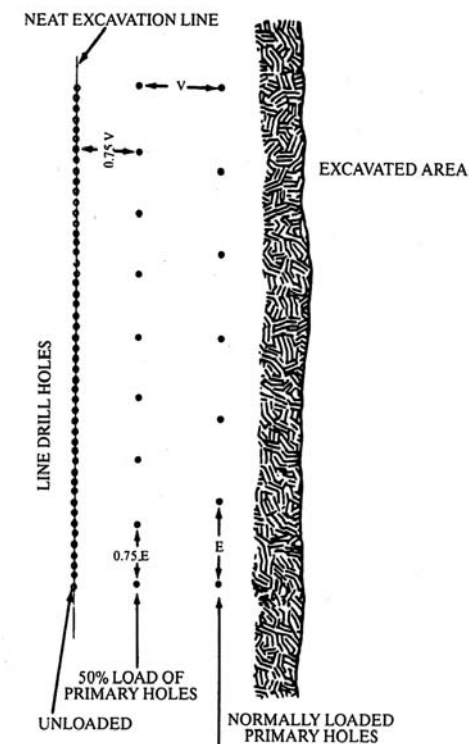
Typical pattern and procedure for line drilling.
